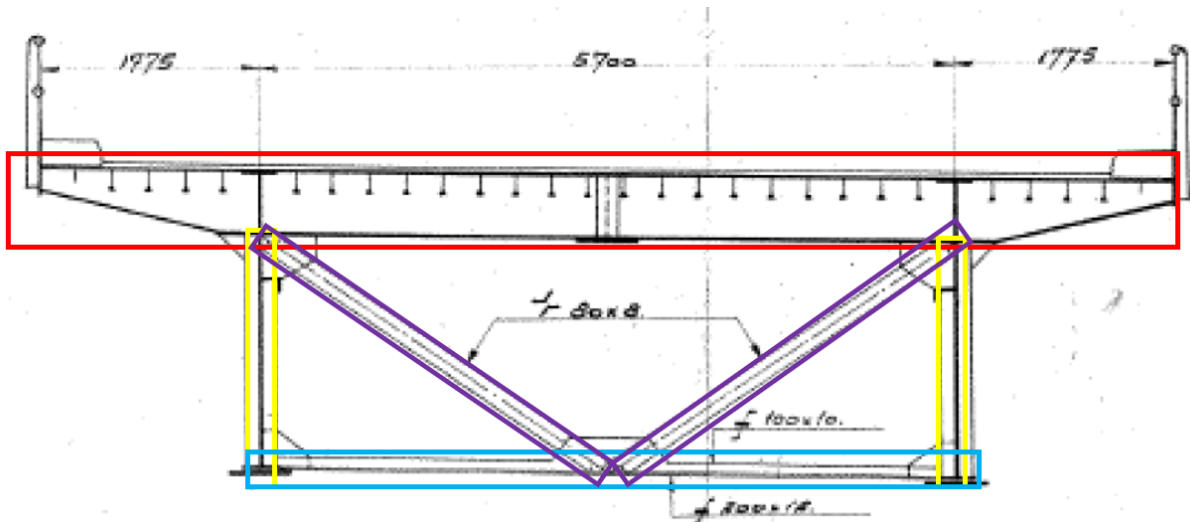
Cross section of the IJsselbridge with highlighted deck (red), K-bracing (purple), bottom cross beam (blue) and main girders (yellow).
